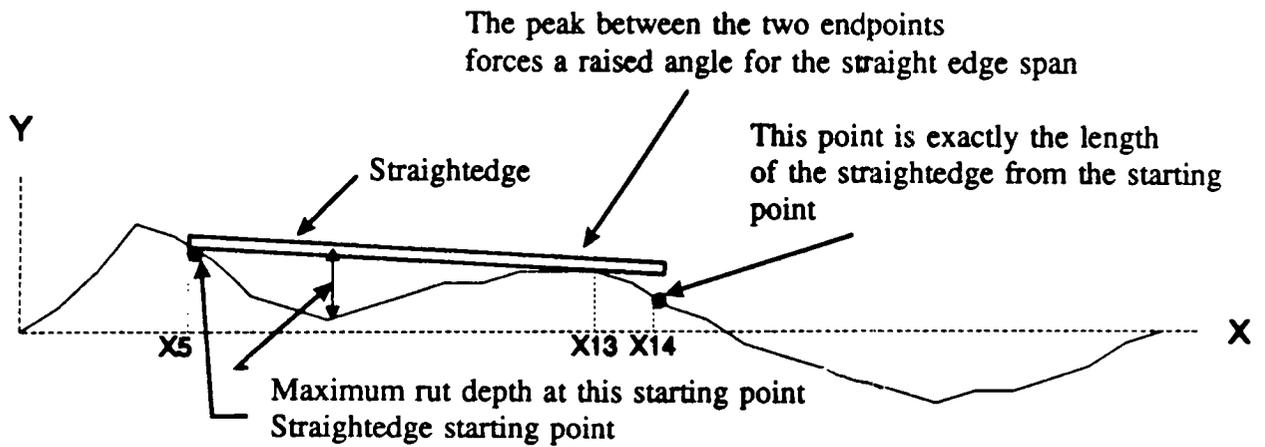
Example of Intermediate Point to Higher Elevation Between Starting Point (X5) and Ending Point (X14) of a Straightedge
